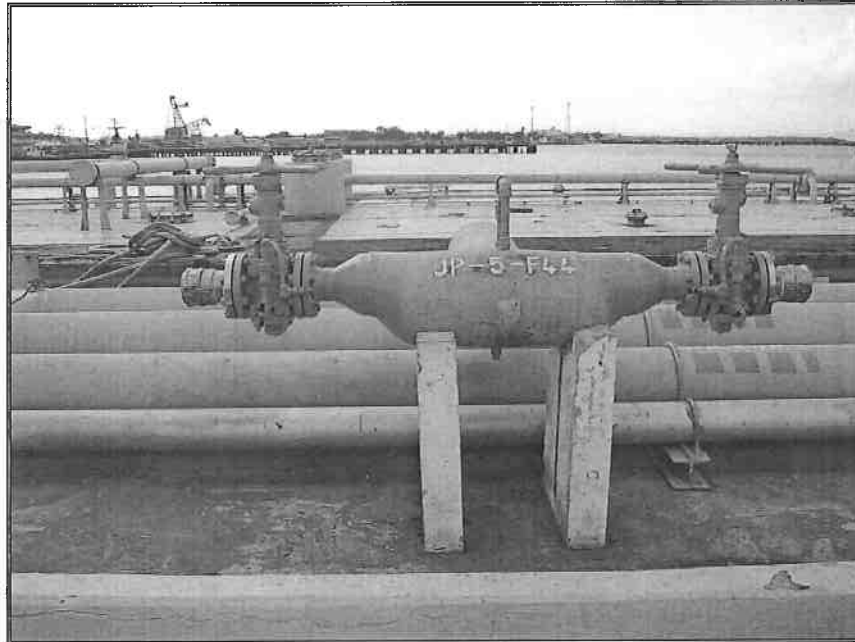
Test No. 1 DFM Blind Flange Gasket Leak
